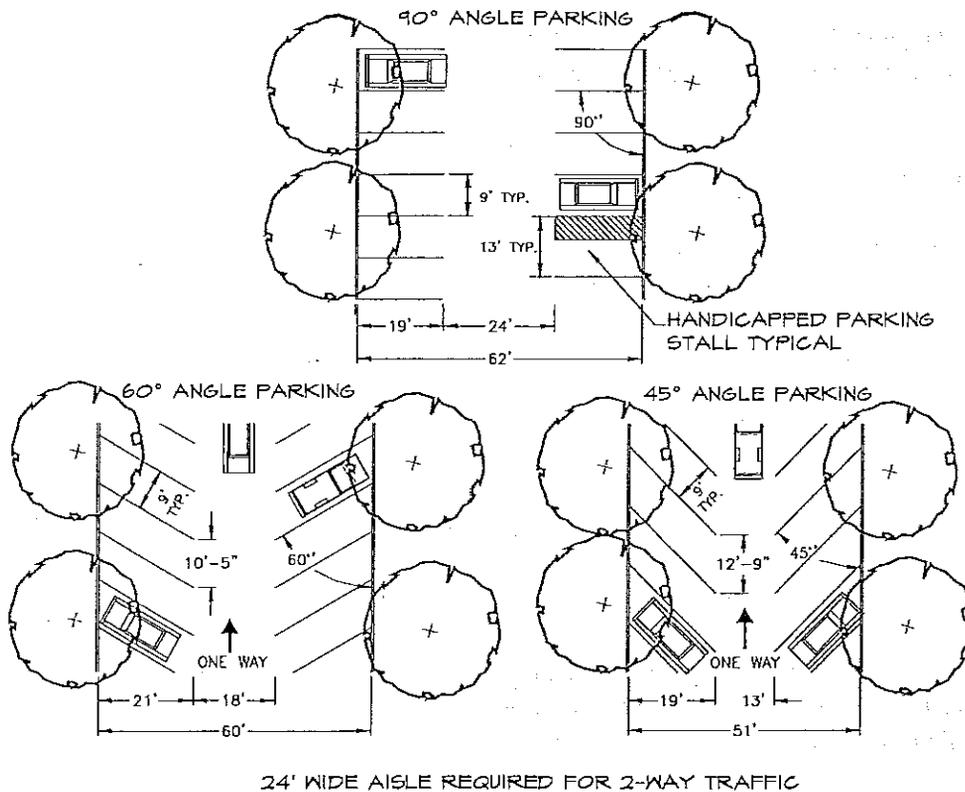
TYPICAL PARKING STALL LAYOUT
